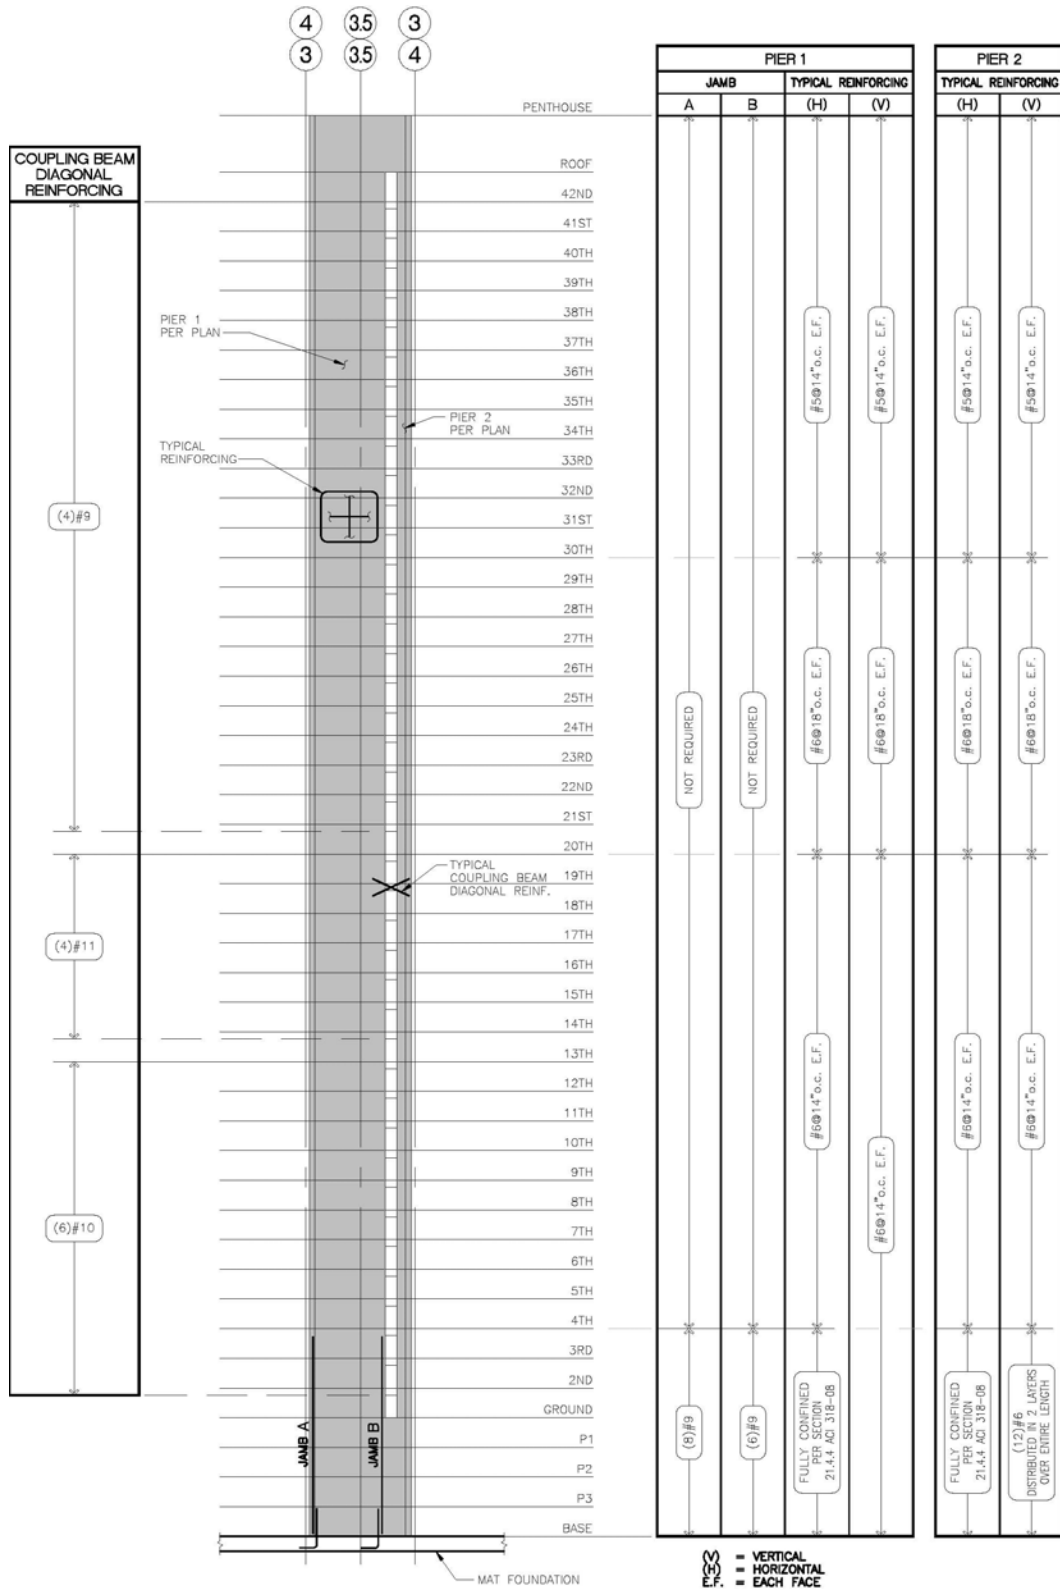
Elevation B and shear wall reinforcing for building 2B
